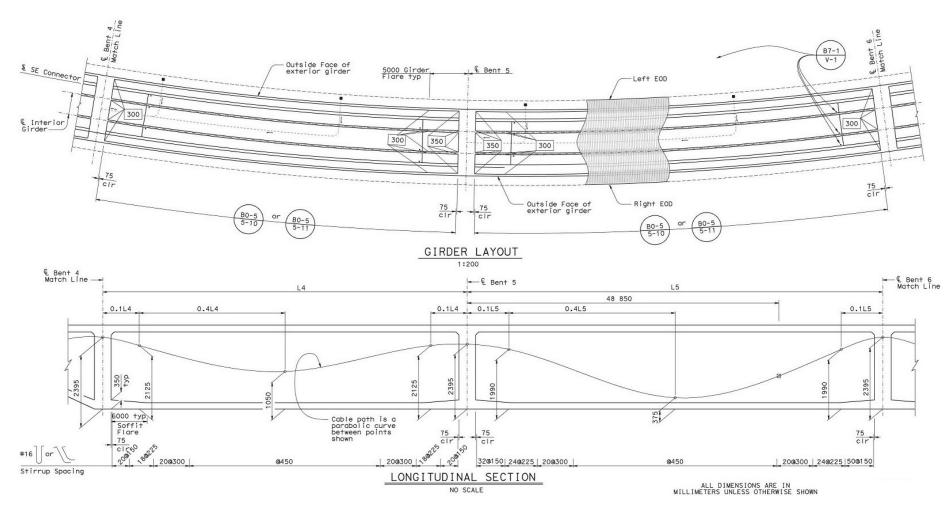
Sample post-tensioned box girders (from Bridge 56-0802F)
